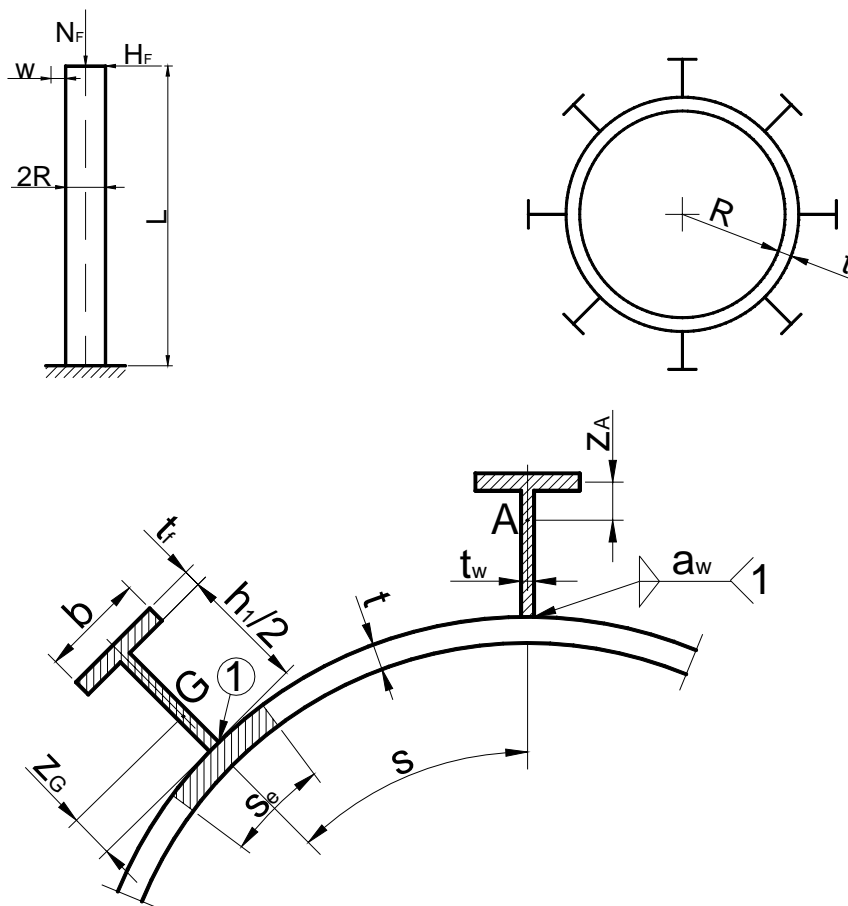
A column constructed as a stiffened cylindrical shell loaded by a compression force N_F and a horizontal force H_F . Cross-section and a detail of the cross-section with outside stiffeners of halved rolled I-section. The horizontal displacement of the top (w) is limited
